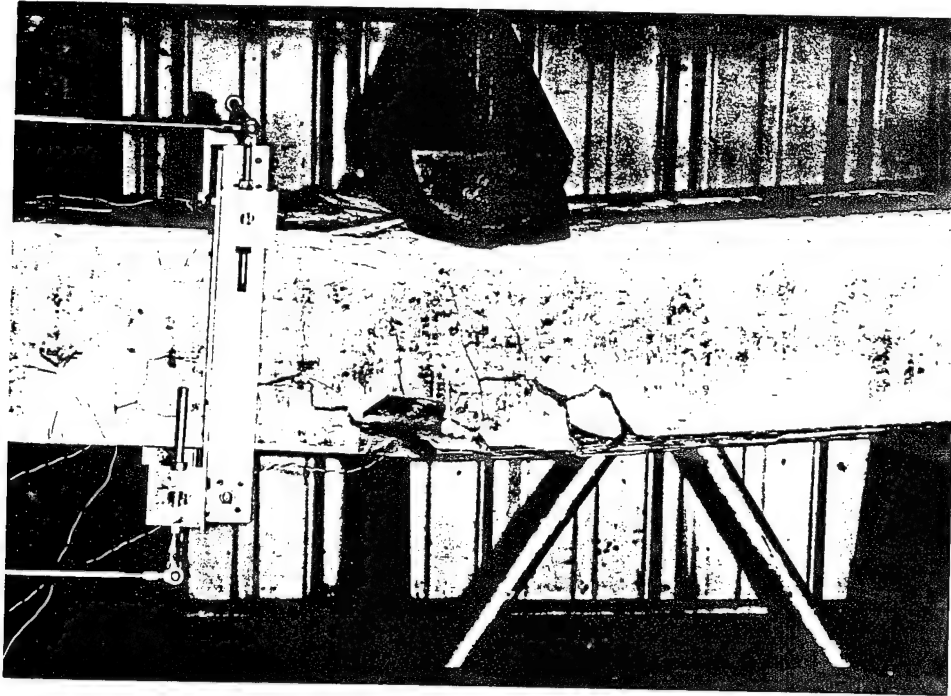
Photograph of beam failure by concrete compression of a Series 6 beam.
